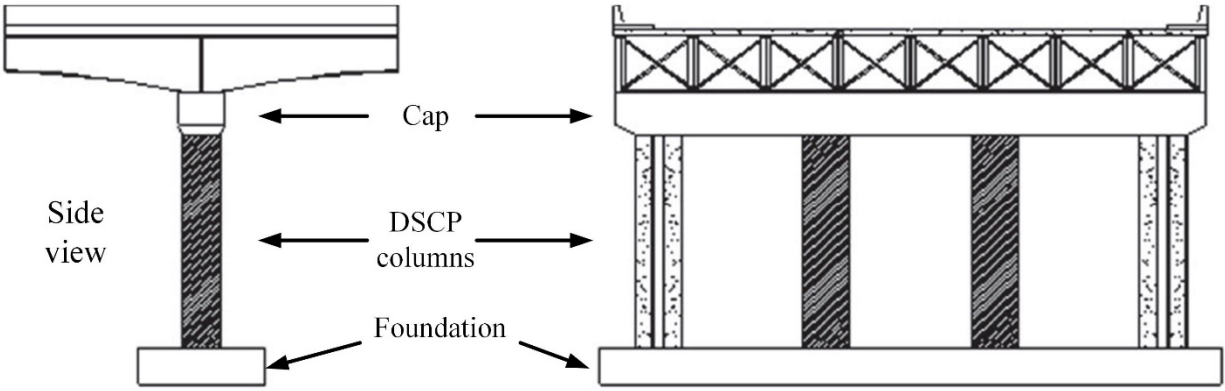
Multi-column pier system with concrete-filled steel tube columns (41)
